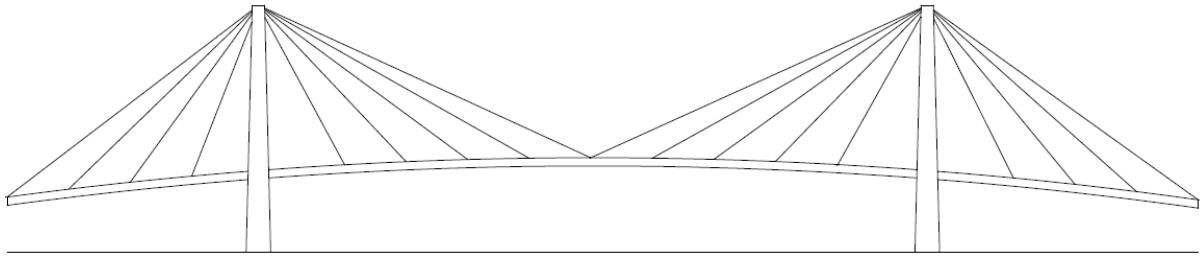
Conceptual design of cable-stayed bridge over Coliseum Boulevard.
